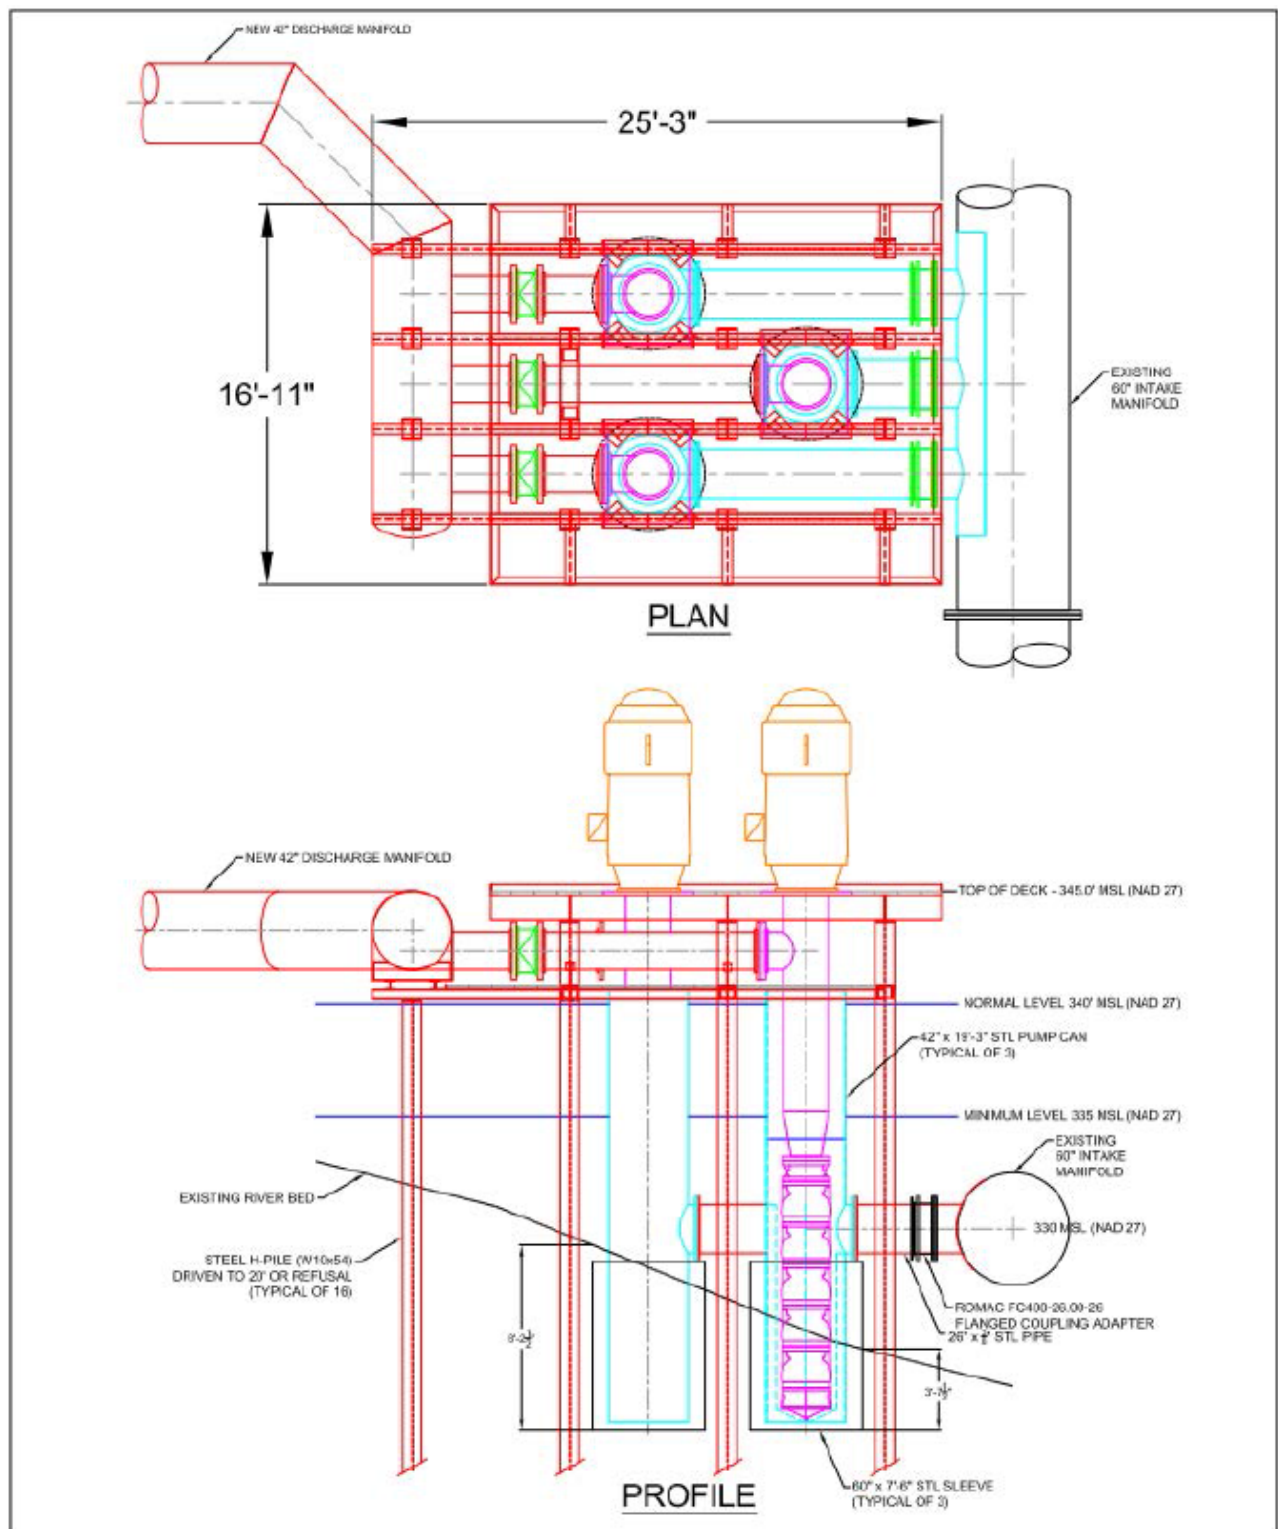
St. Hilaire Brothers pump station expansion plan and profile.
